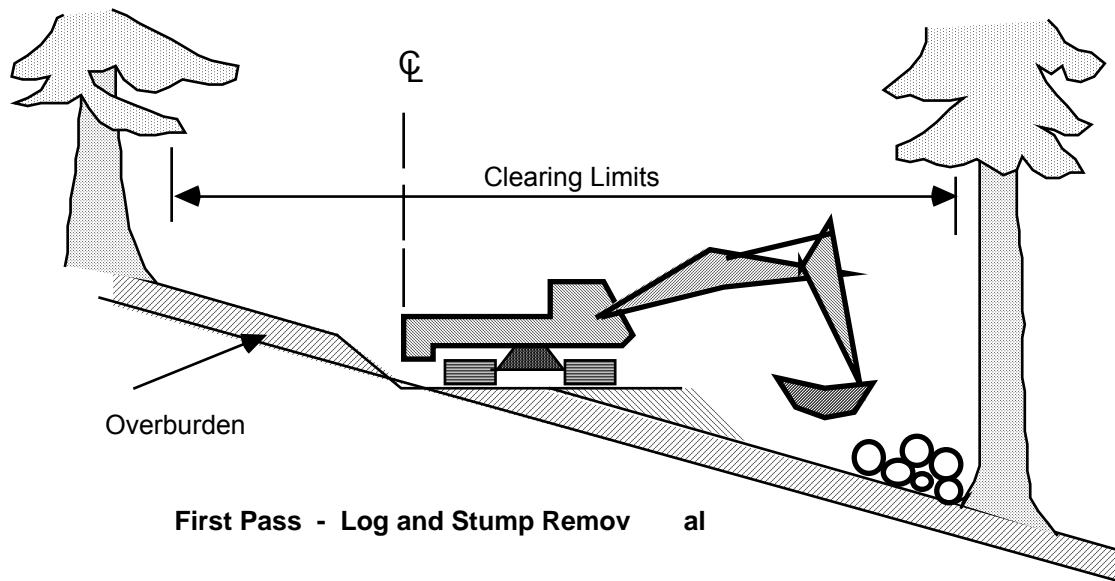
First pass with excavator, clearing logs and stumps from construction site. Working platform or pioneer road just outside of planned road surface width.
